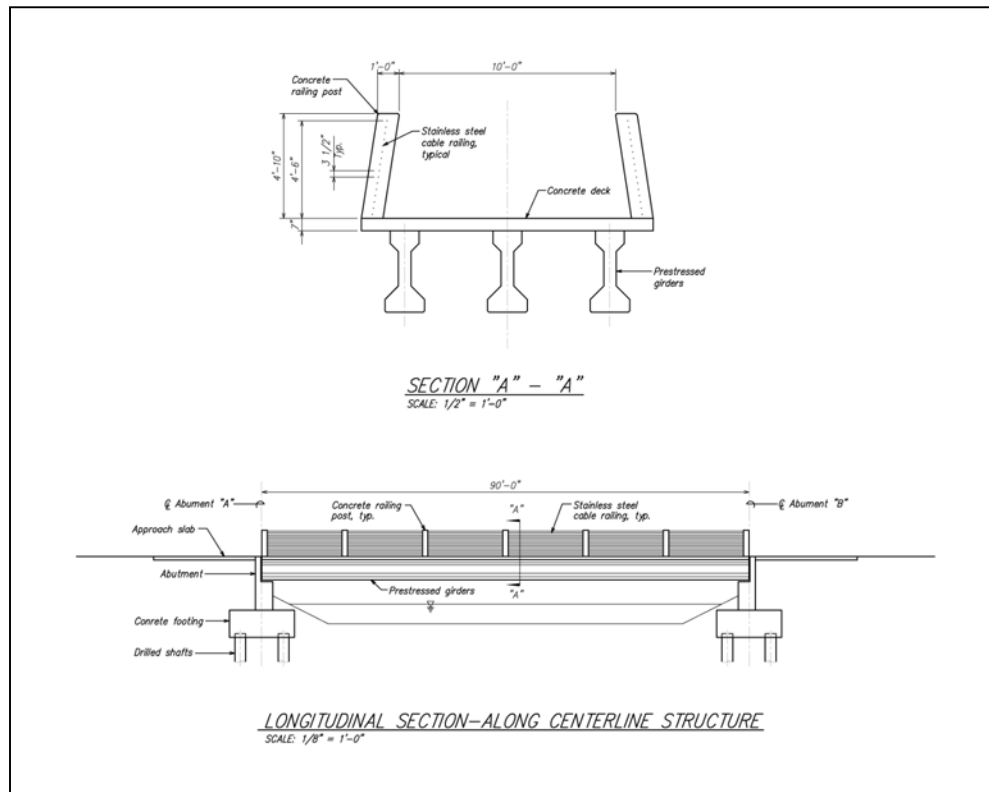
Proposed bridge Option 2 – Pre-stressed girder
